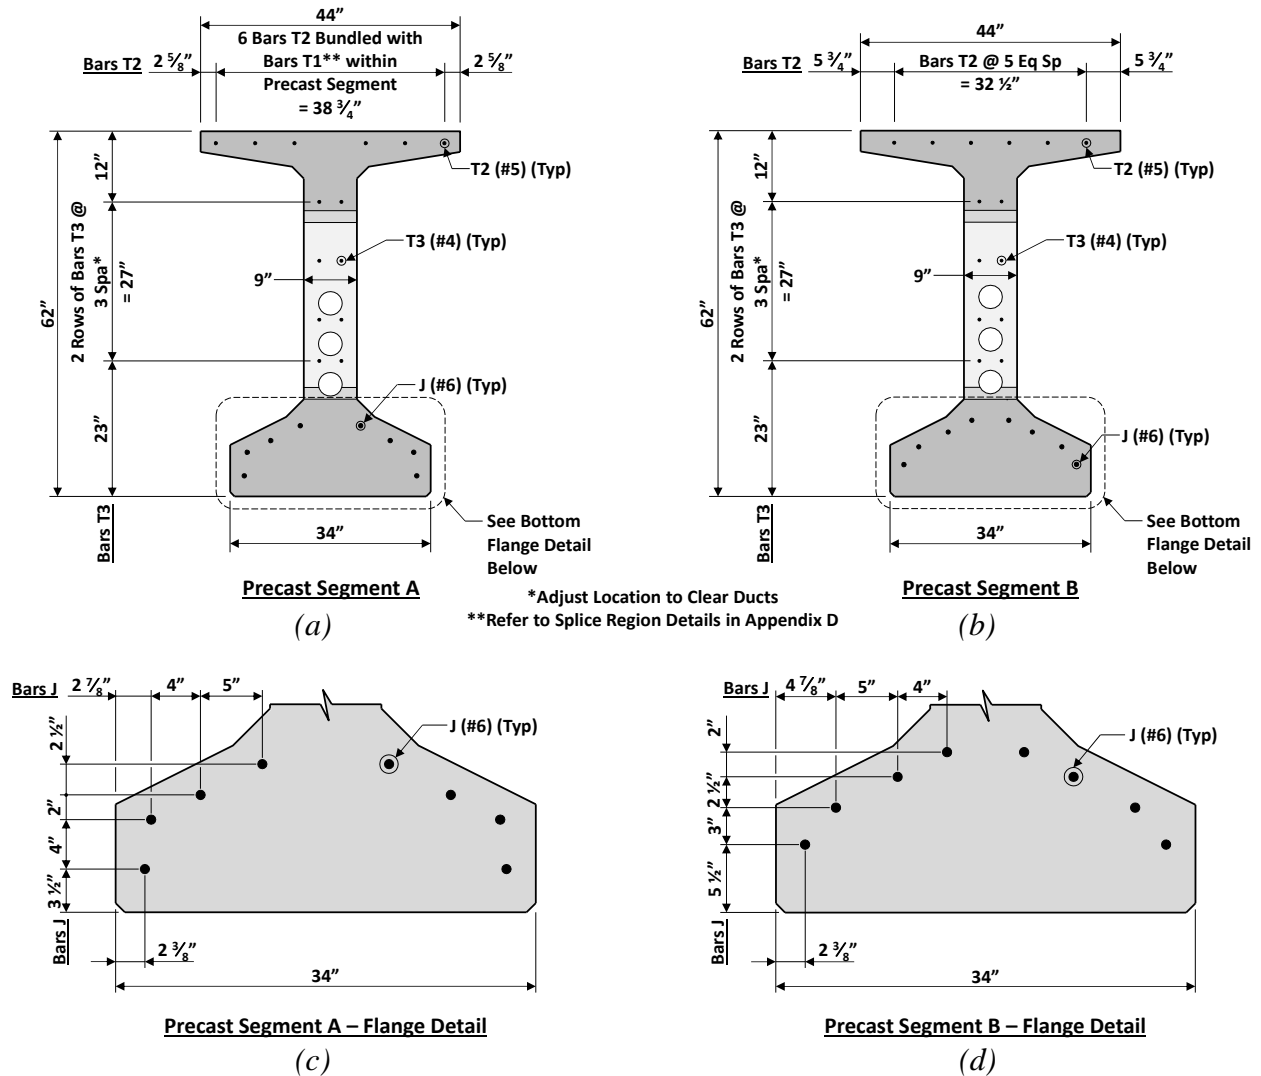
Recommended longitudinal interface reinforcement– (a) end of Precast Segment A; (b) end of Precast Segment B; (c) flange detail of Precast Segment A; (d) flange detail of Precast Segment B
